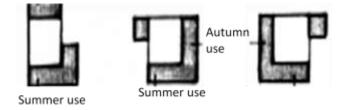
Mixed types plan in Diyarbakir traditional houses (Bekleyen&Dalkiliç,2011)
